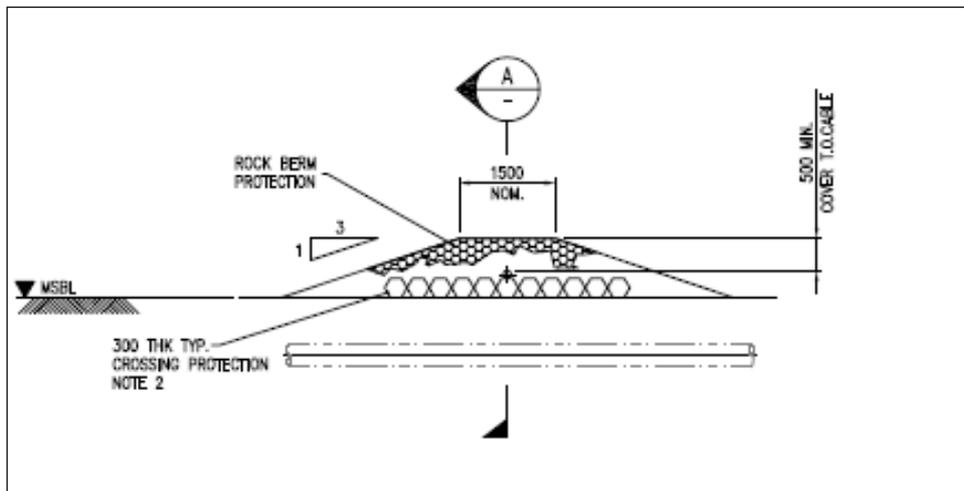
Section through a typical trenched and backfilled pipeline crossing
